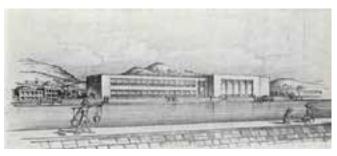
Queen's College in new premise (Source: Hong Kong and Far East Builder 1950, vol. 8, no. 3)
